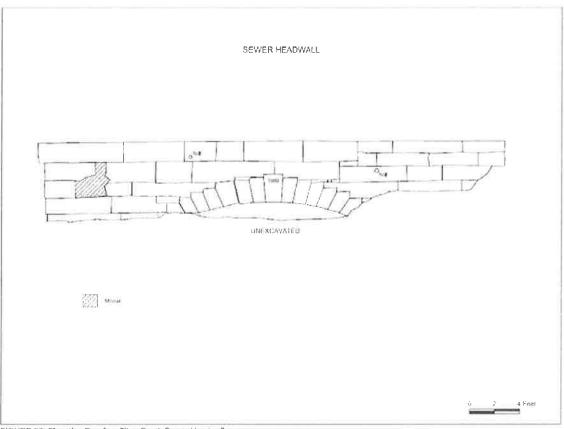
Elevation Drawing, Tiber Creek Sewer Headwall
